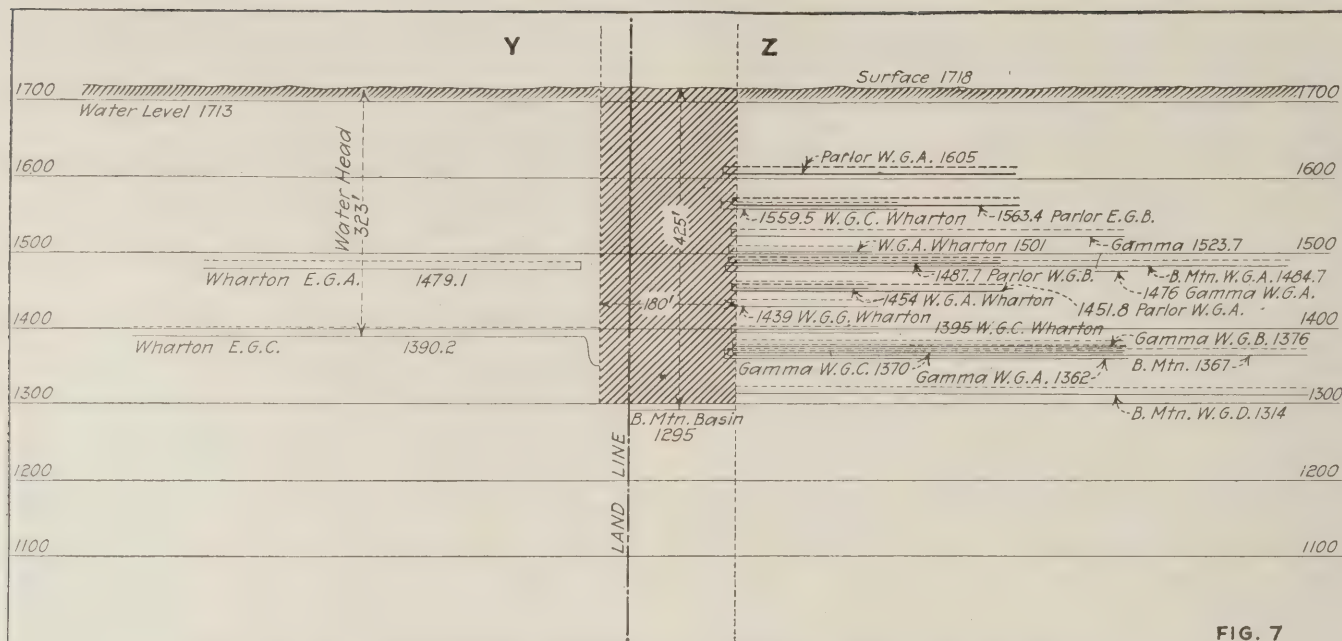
LONGITUDINAL SECTION OF A BARRIER PILLAR 180 FT. WIDE
